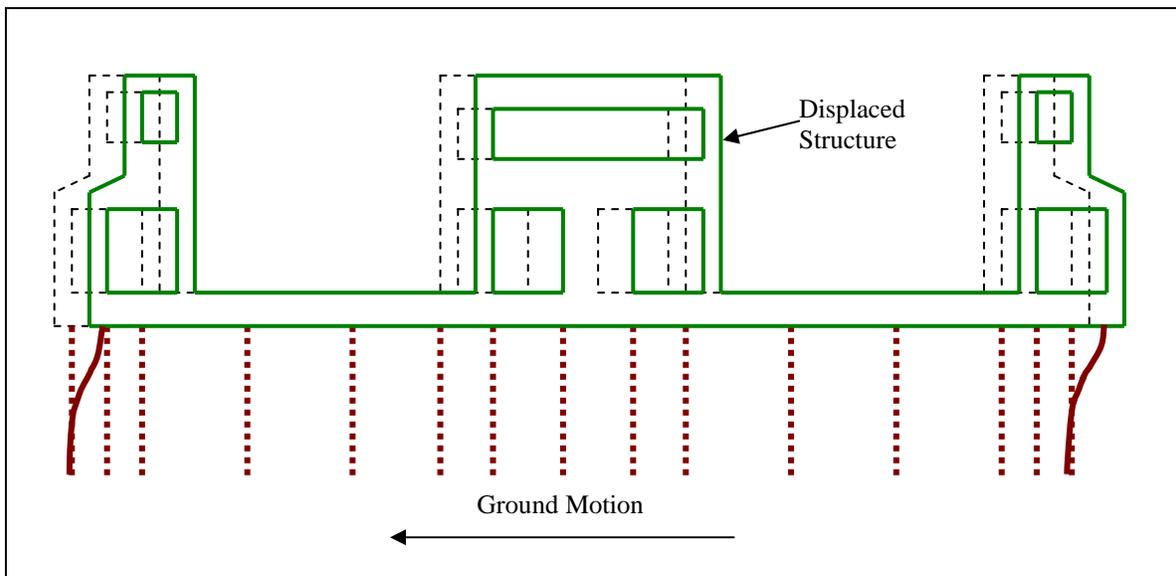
Navigation Lock on Flexible Pile Foundation
